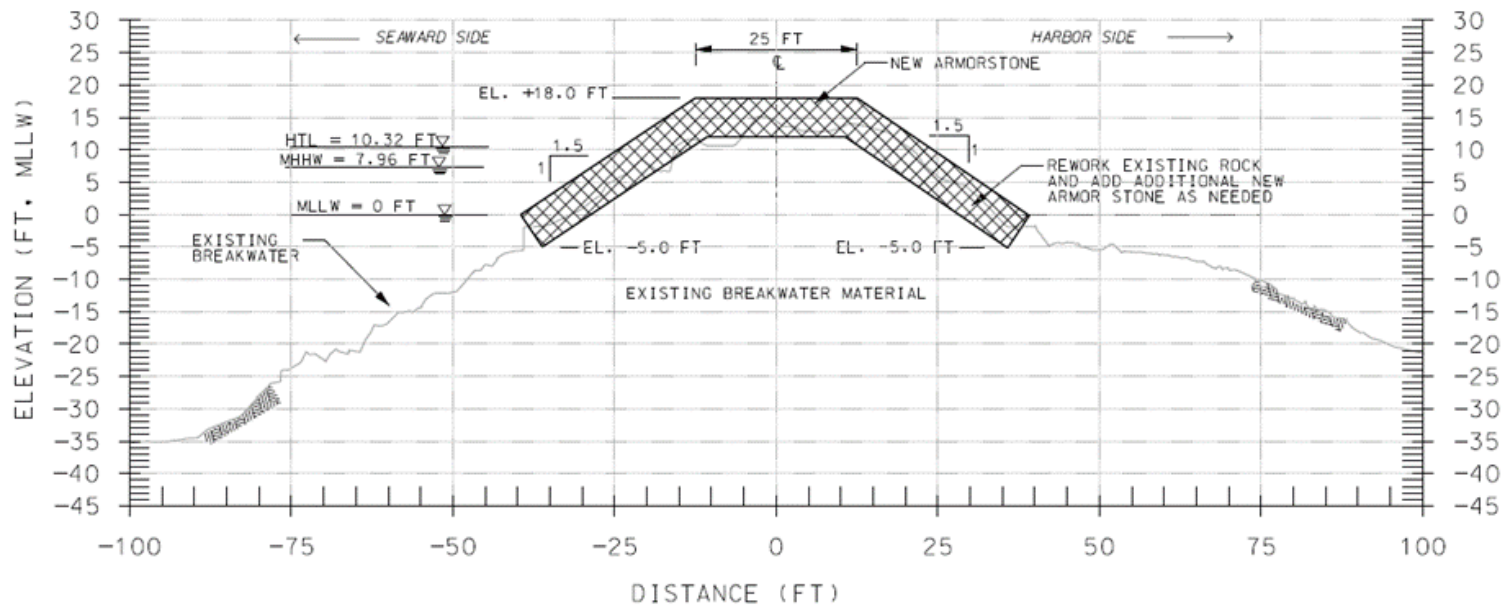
Proposed Repairs Along Less-Damaged Section of the Outer Breakwater
